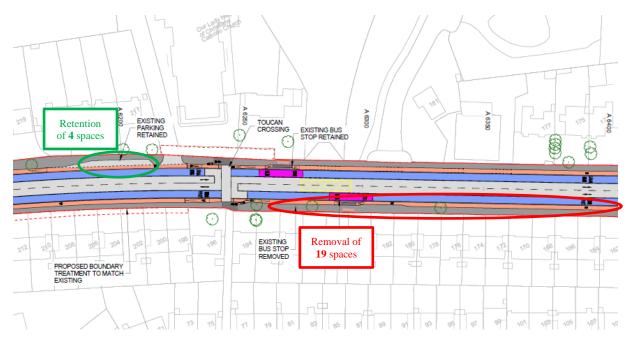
Proposed scheme design on Navan Road (west of Nephin Road)
